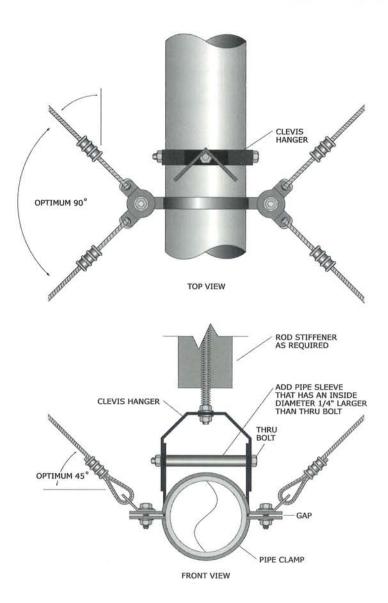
Pipe clamp supports with all directional brace and hanger rod.
